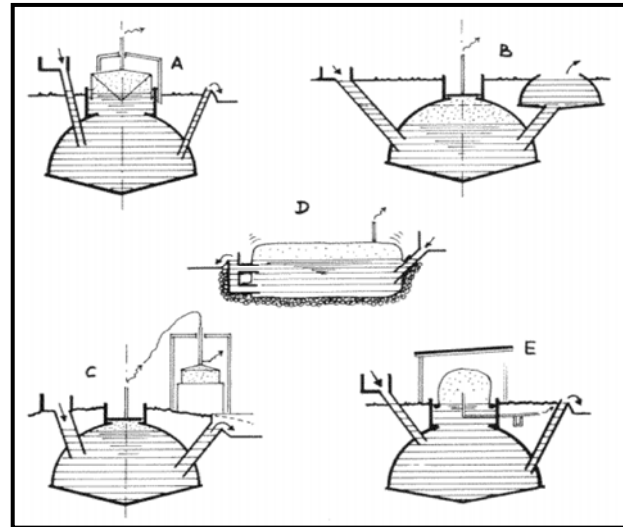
Simple Biogas Plants. A) Floating -drum plant, B) Fixed-Dome Plant, C) Fixed-Dome Plant with separate Gas Holder, D) Ballon Plant, E) Channel-type digester with plastic sheeting and sunshade (Source- L. Sasse, GATE, 1988 p14)
